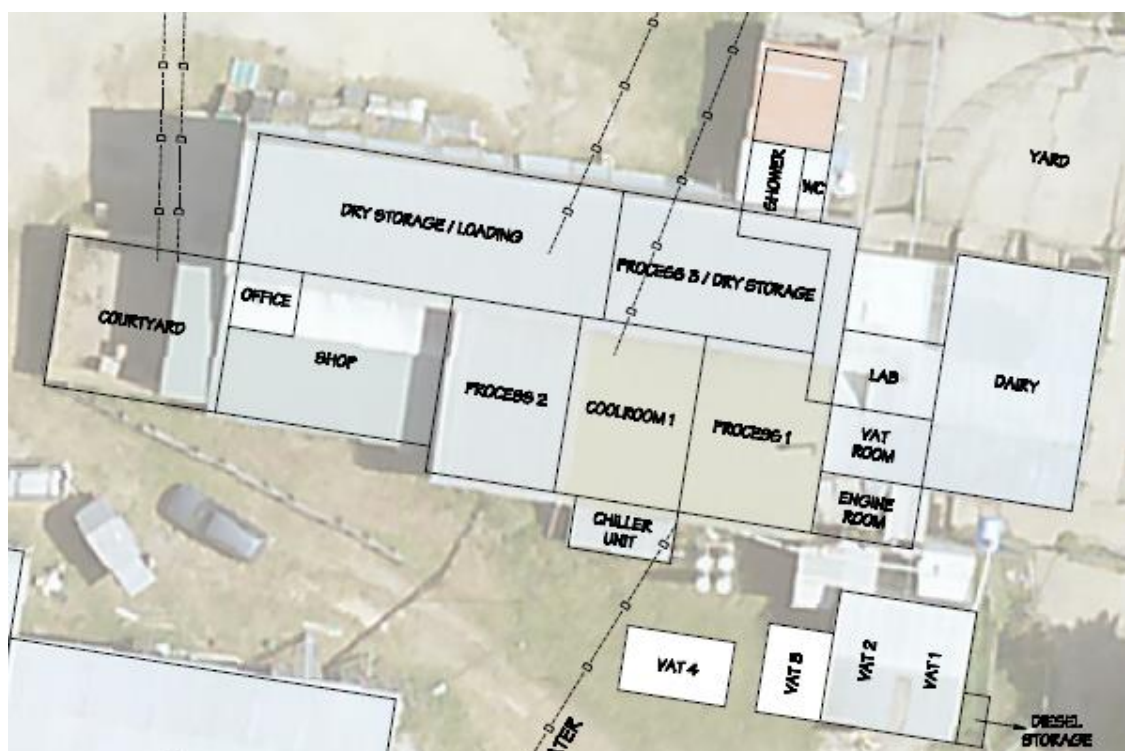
Gippsland Jersey Milk Processing Factory – Indicative Floor Plan
